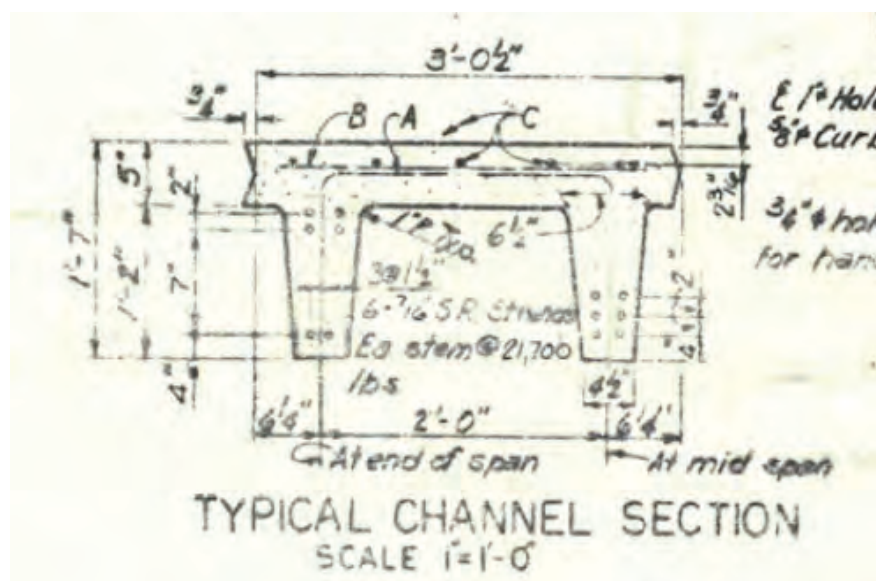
Wide-Leg Channel Beam Typical Section (post-1976)
